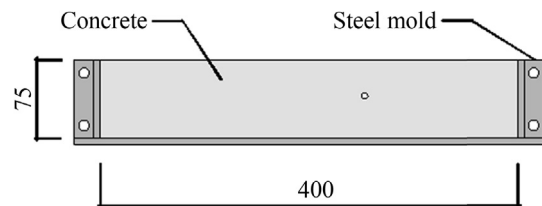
Measurement of the drying shrinkage in the concrete specimen.
